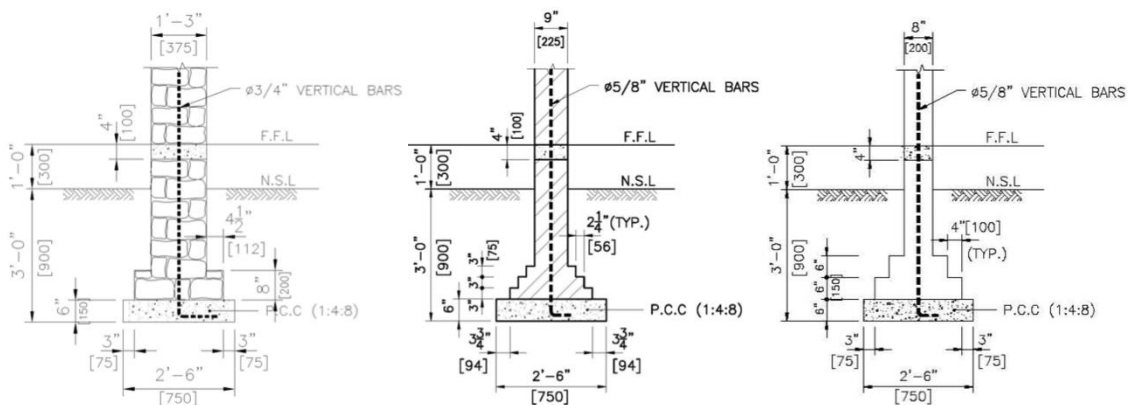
In that order: Examples of stone, brick and concrete block masonry foundations, by ERRA
